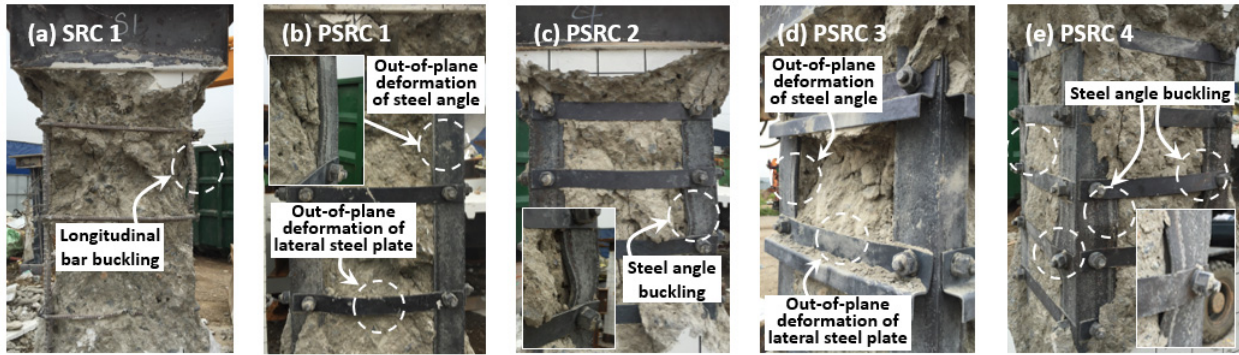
Failure modes of longitudinal steel angles, longitudinal bars, and lateral steel plates
